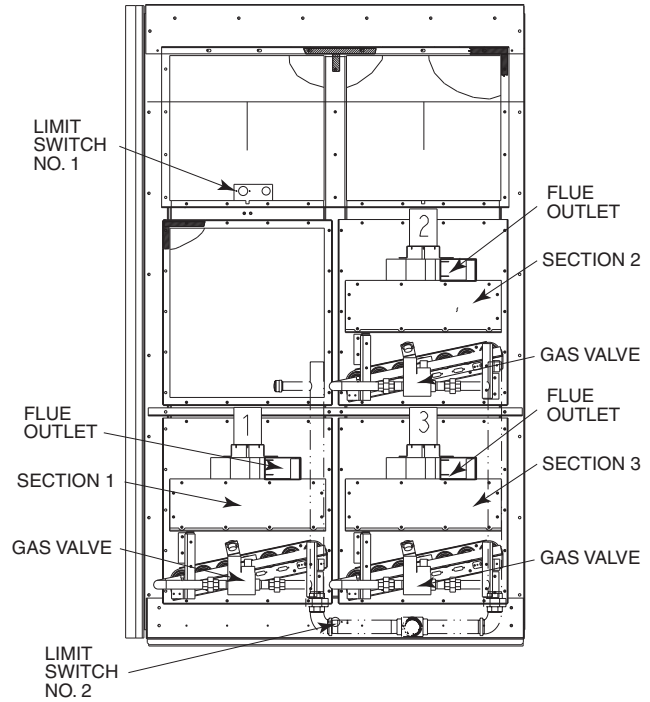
Gas Section Detail, Sizes 055-100 — High Heat
